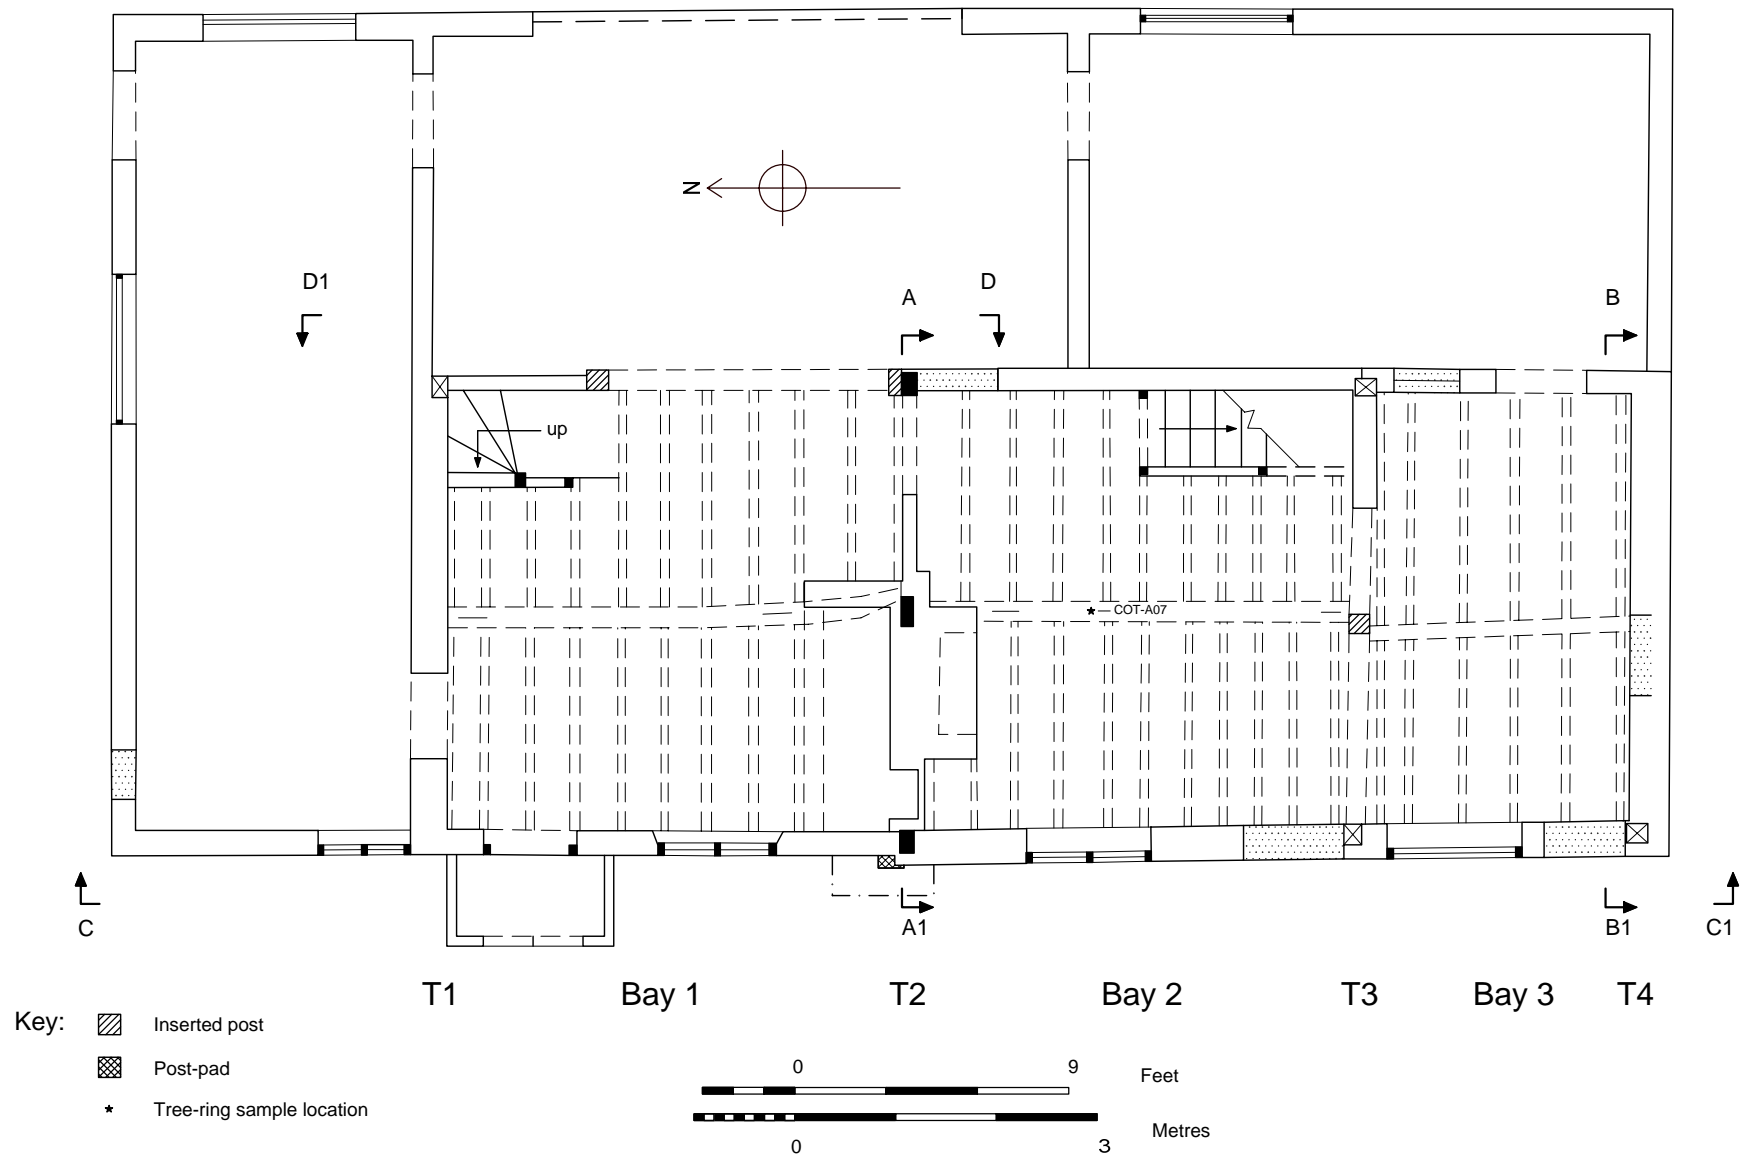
The Old Cottage, Main Street, Cotesbach. Ground Floor Plan, with locations of sections/elevations A - D.
